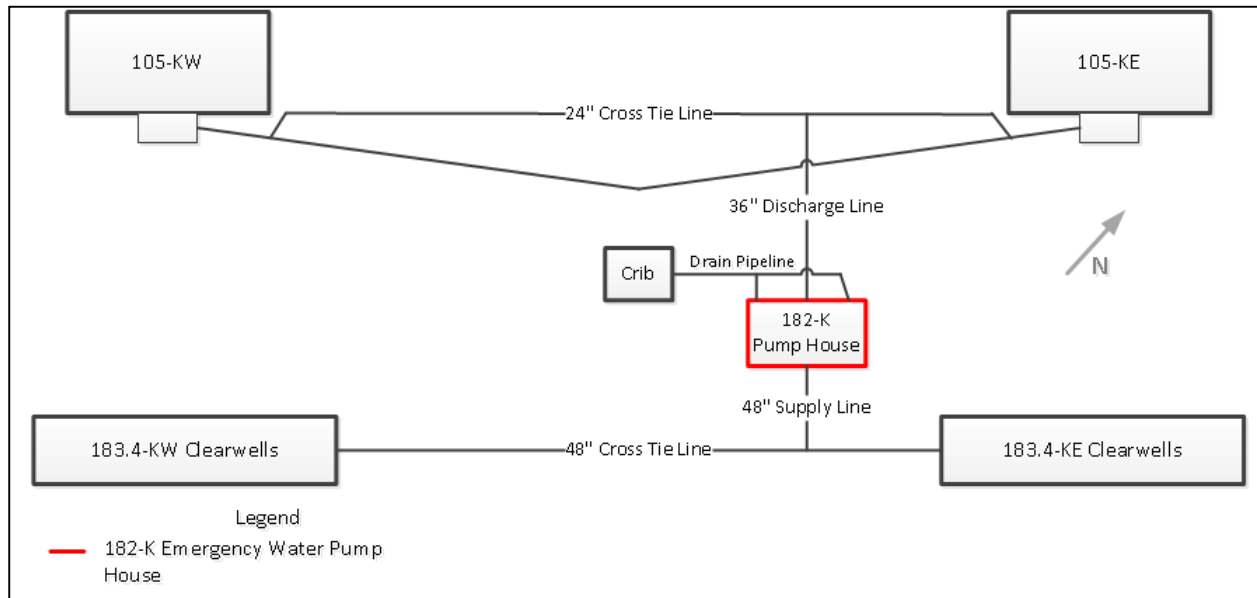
182-K Pump House, Crib and Pipeline Layout
